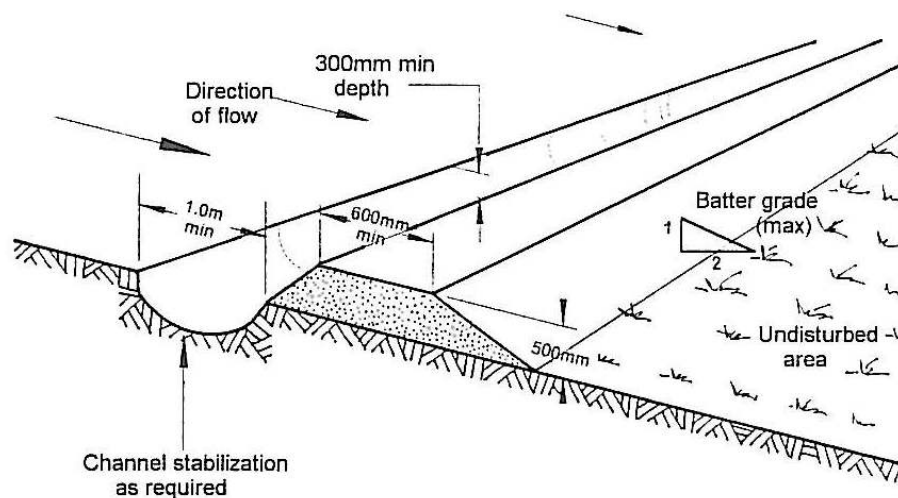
Cross-section of typical catch drain (Source: IE Aust, 1996).
